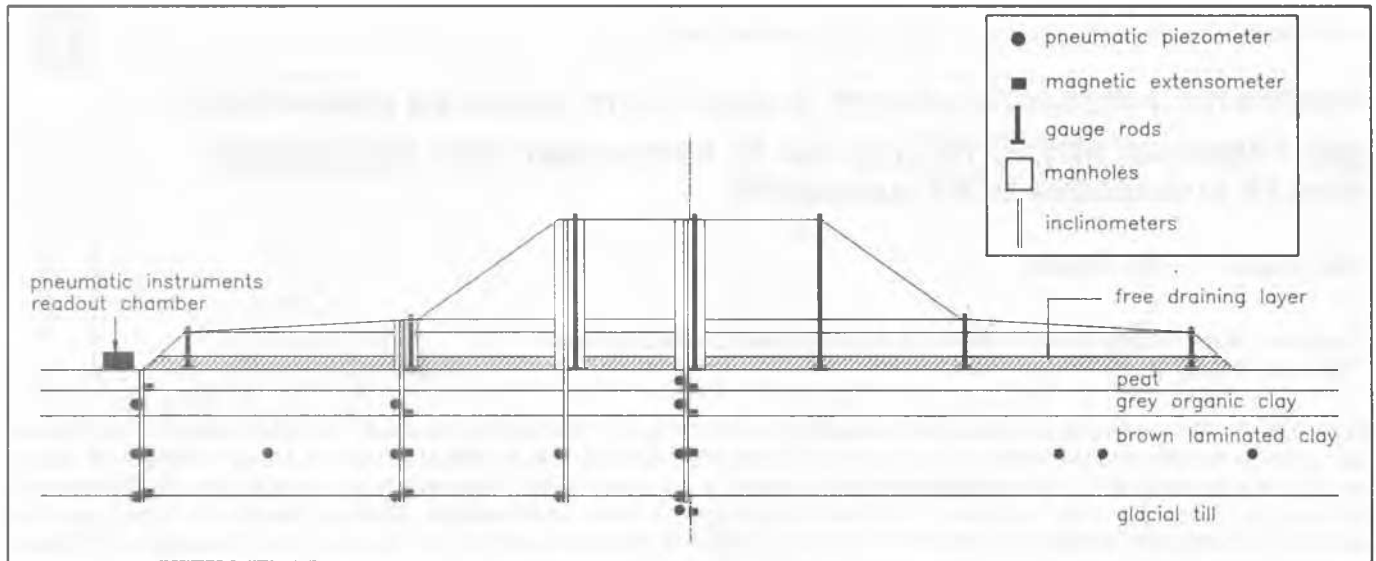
The layout of ground instrumentation at the control section of Section F.
